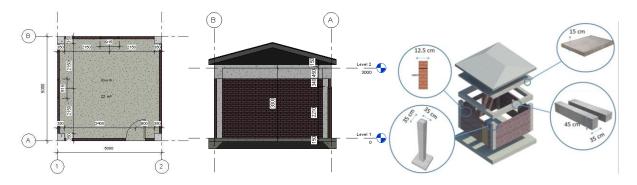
Case study- I: architectural plan (left), section (middle), structural system details of concrete-framed structure (right).
